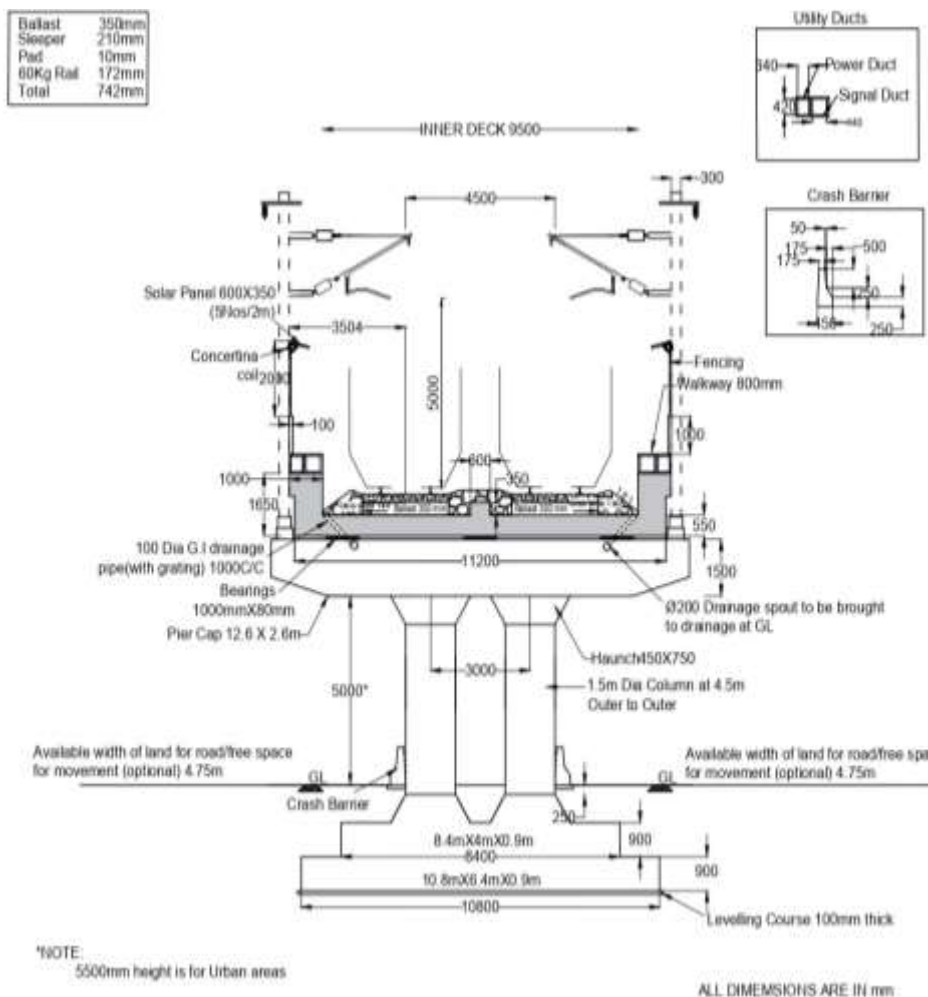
General Arrangement of Viaduct with twin-U type girder, 2 columns and open foundations for more vertical clearance
